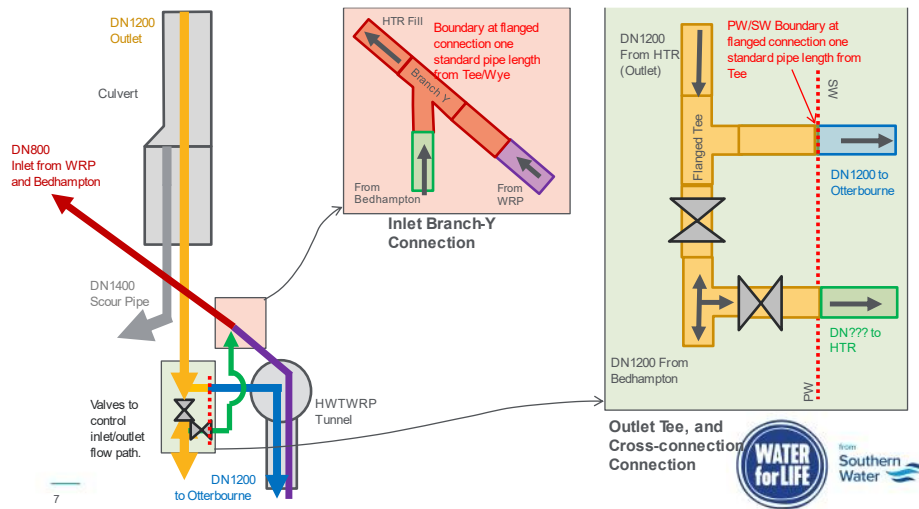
Draft Site Layout of interaction of SW and PW connection near to HTR
